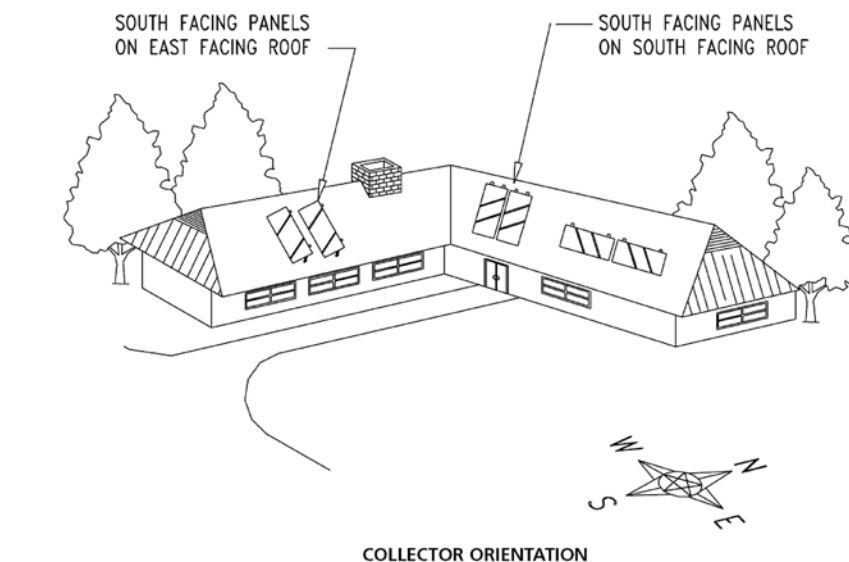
Standard roof mounting configurations of an antifreeze system. (Courtesy of SunEarth)
